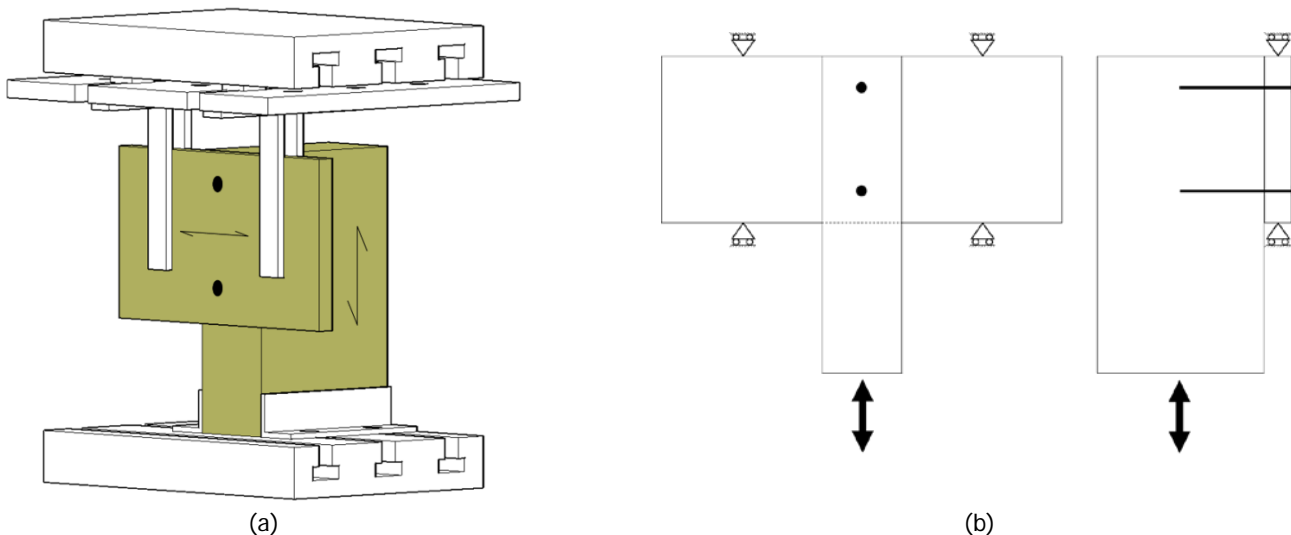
Test set-up (a) and forces acting on specimen (b) for loading parallel to joist (configuration B)
